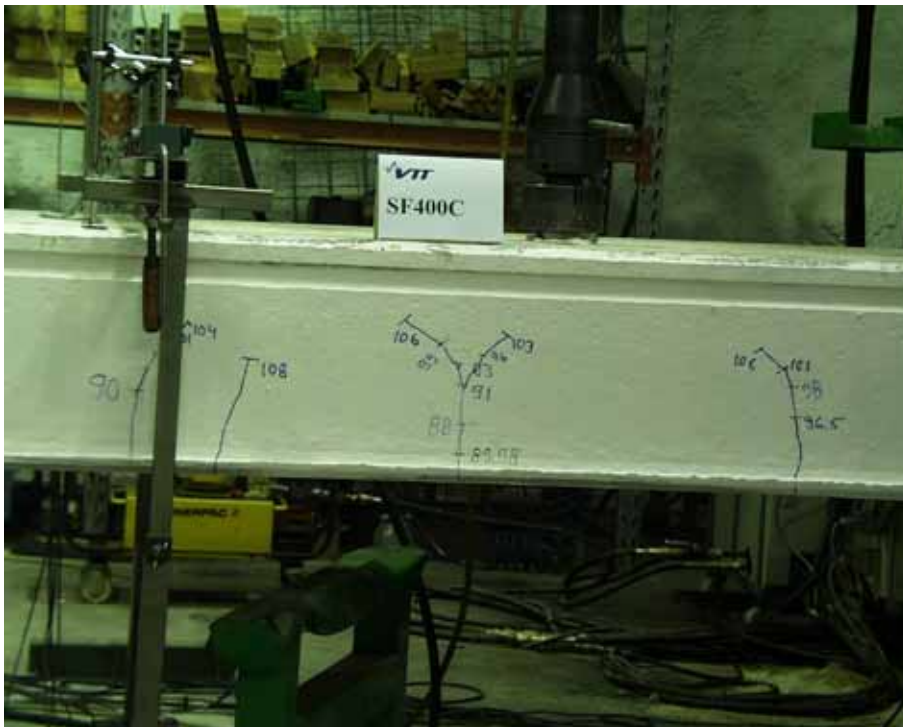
SF400C. Flexural cracks in mid-span, detail of Fig. 68.
